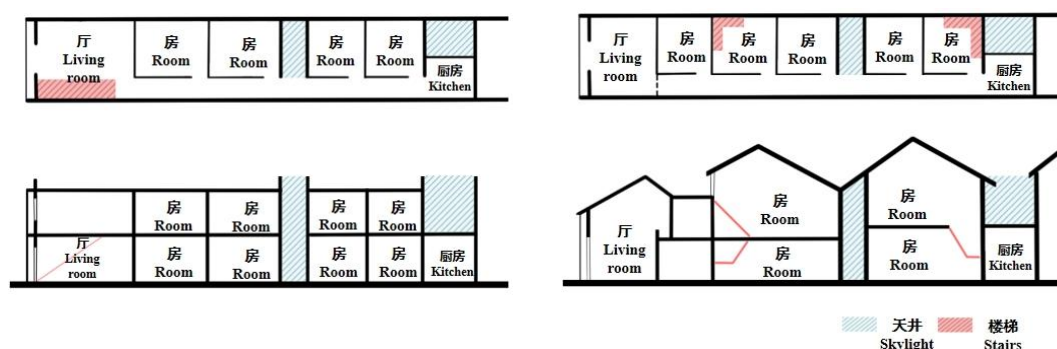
Plan and Section of Two Typical Bamboo Houses
